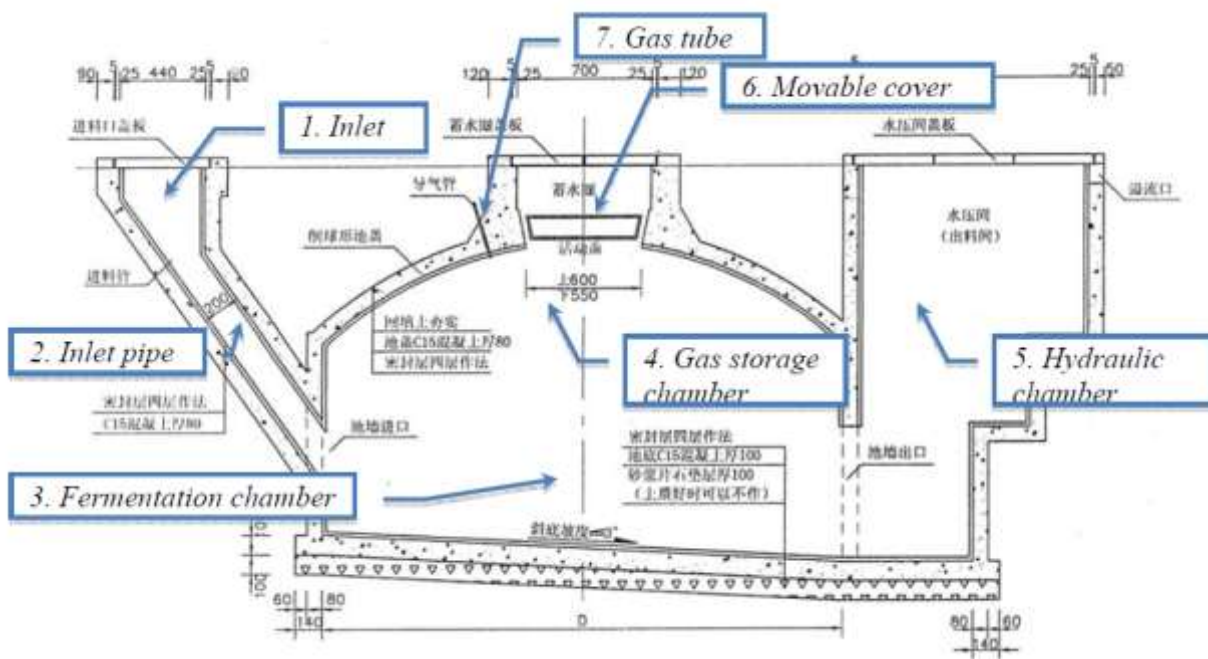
Typical design of a household biogas digester installed under the proposed PoA.
